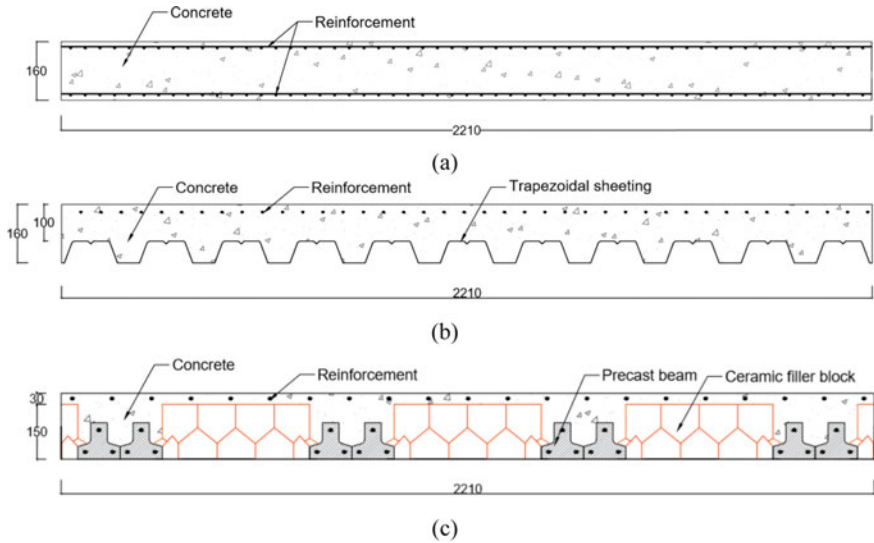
Cross sections of the floor used in the comparative analysis: a concrete floor; b steel and concrete composite floor; c precast floor. Unit: millimeter
